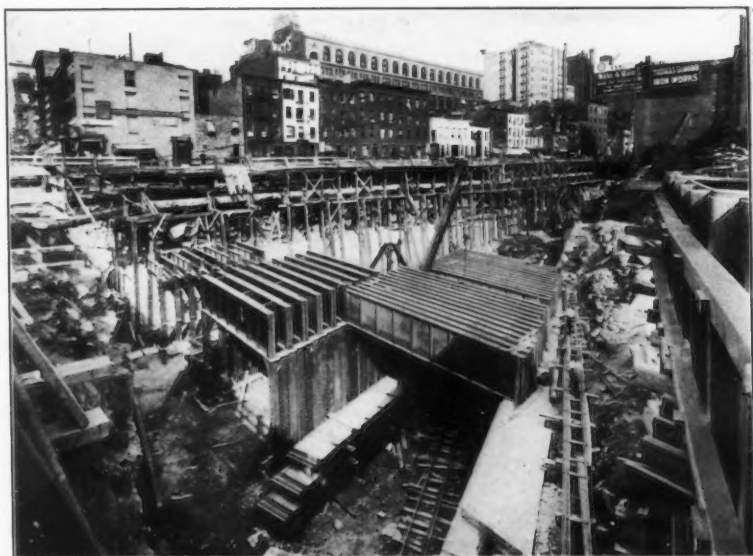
STEEL ROOFING, EASTERLY PORTION.
